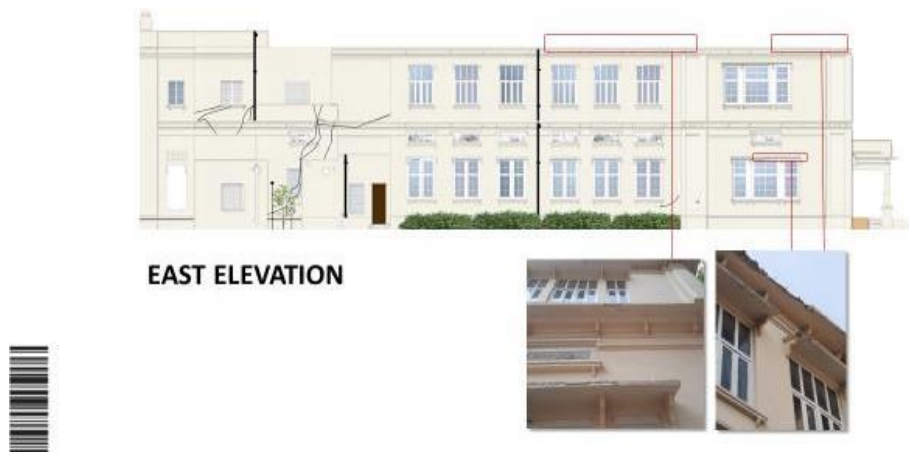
EAST ELEVATION OF GANGA RAM BUILDING , LCWU , LAHORE.
